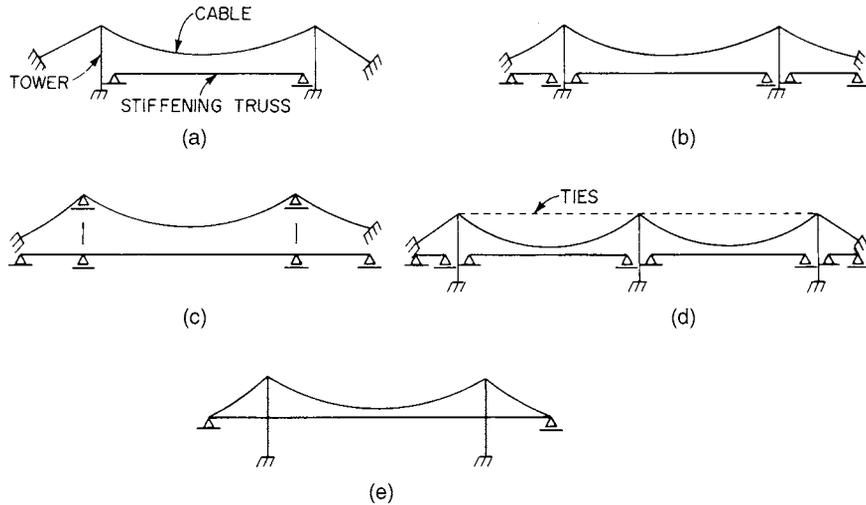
Suspension-bridge arrangements. (a) One suspended span, with pin-ended stiffening truss. (b) Three suspended spans, with pin-ended stiffening trusses. (c) Three suspended spans, with continuous stiffening truss. (d) Multispan bridge, with pin-ended stiffening trusses. (e) Self-anchored suspension bridge.
